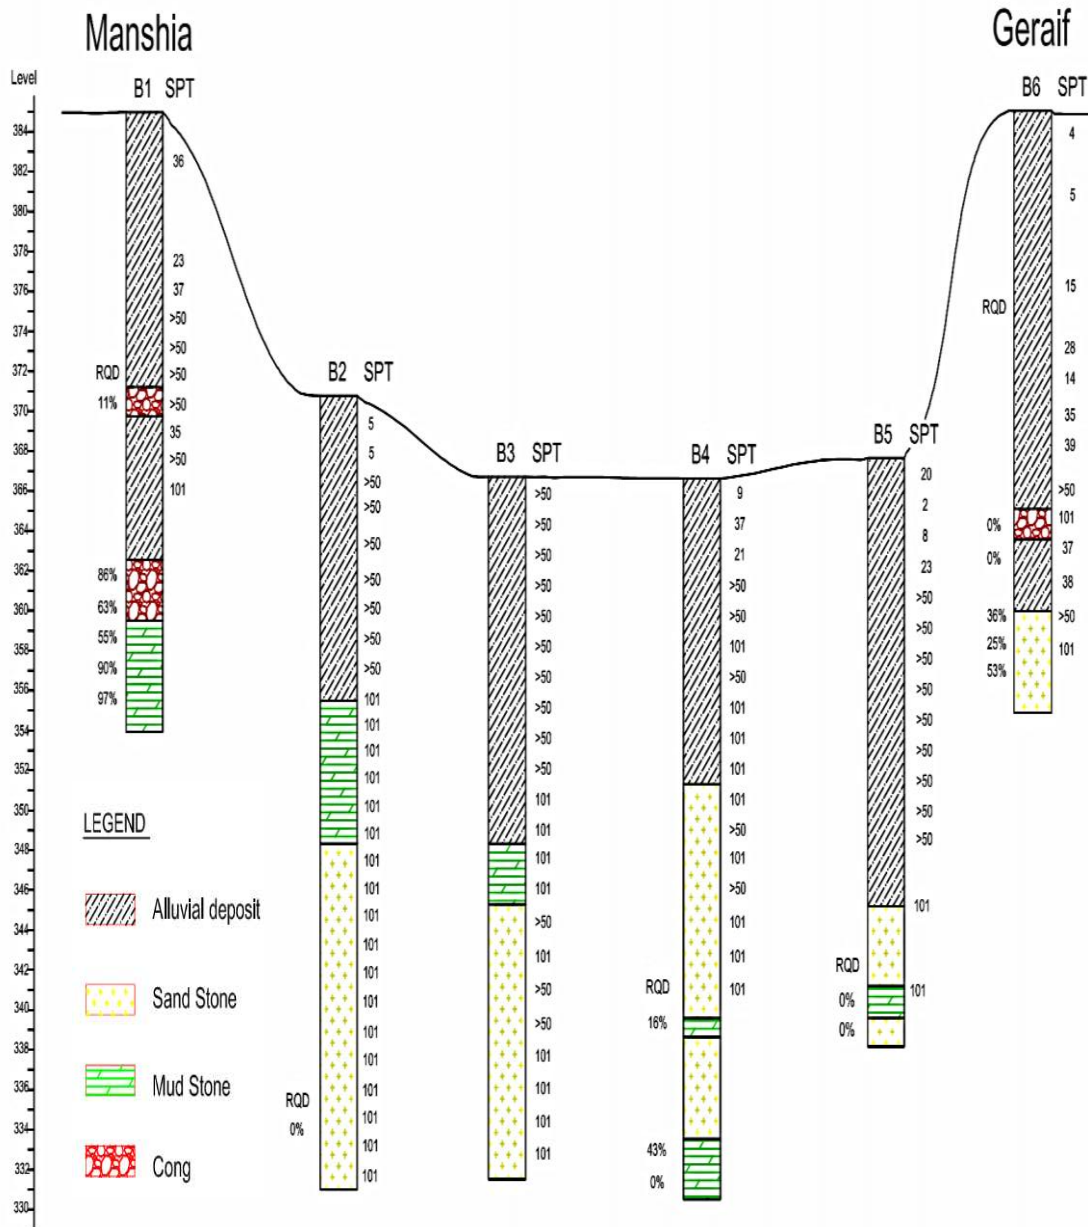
Subsurface profile of Geraif- Manshia Bridge site
